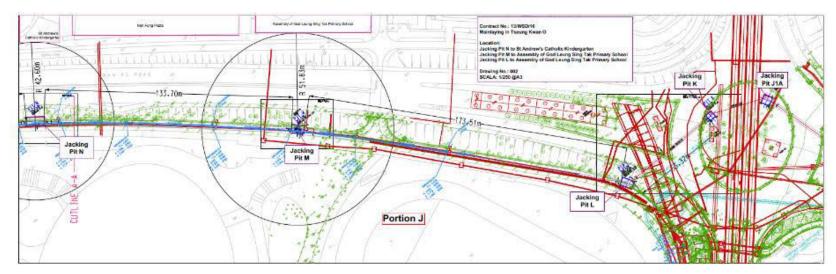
Location Plan for Portion J – Pit L-M-N, K, J1A
